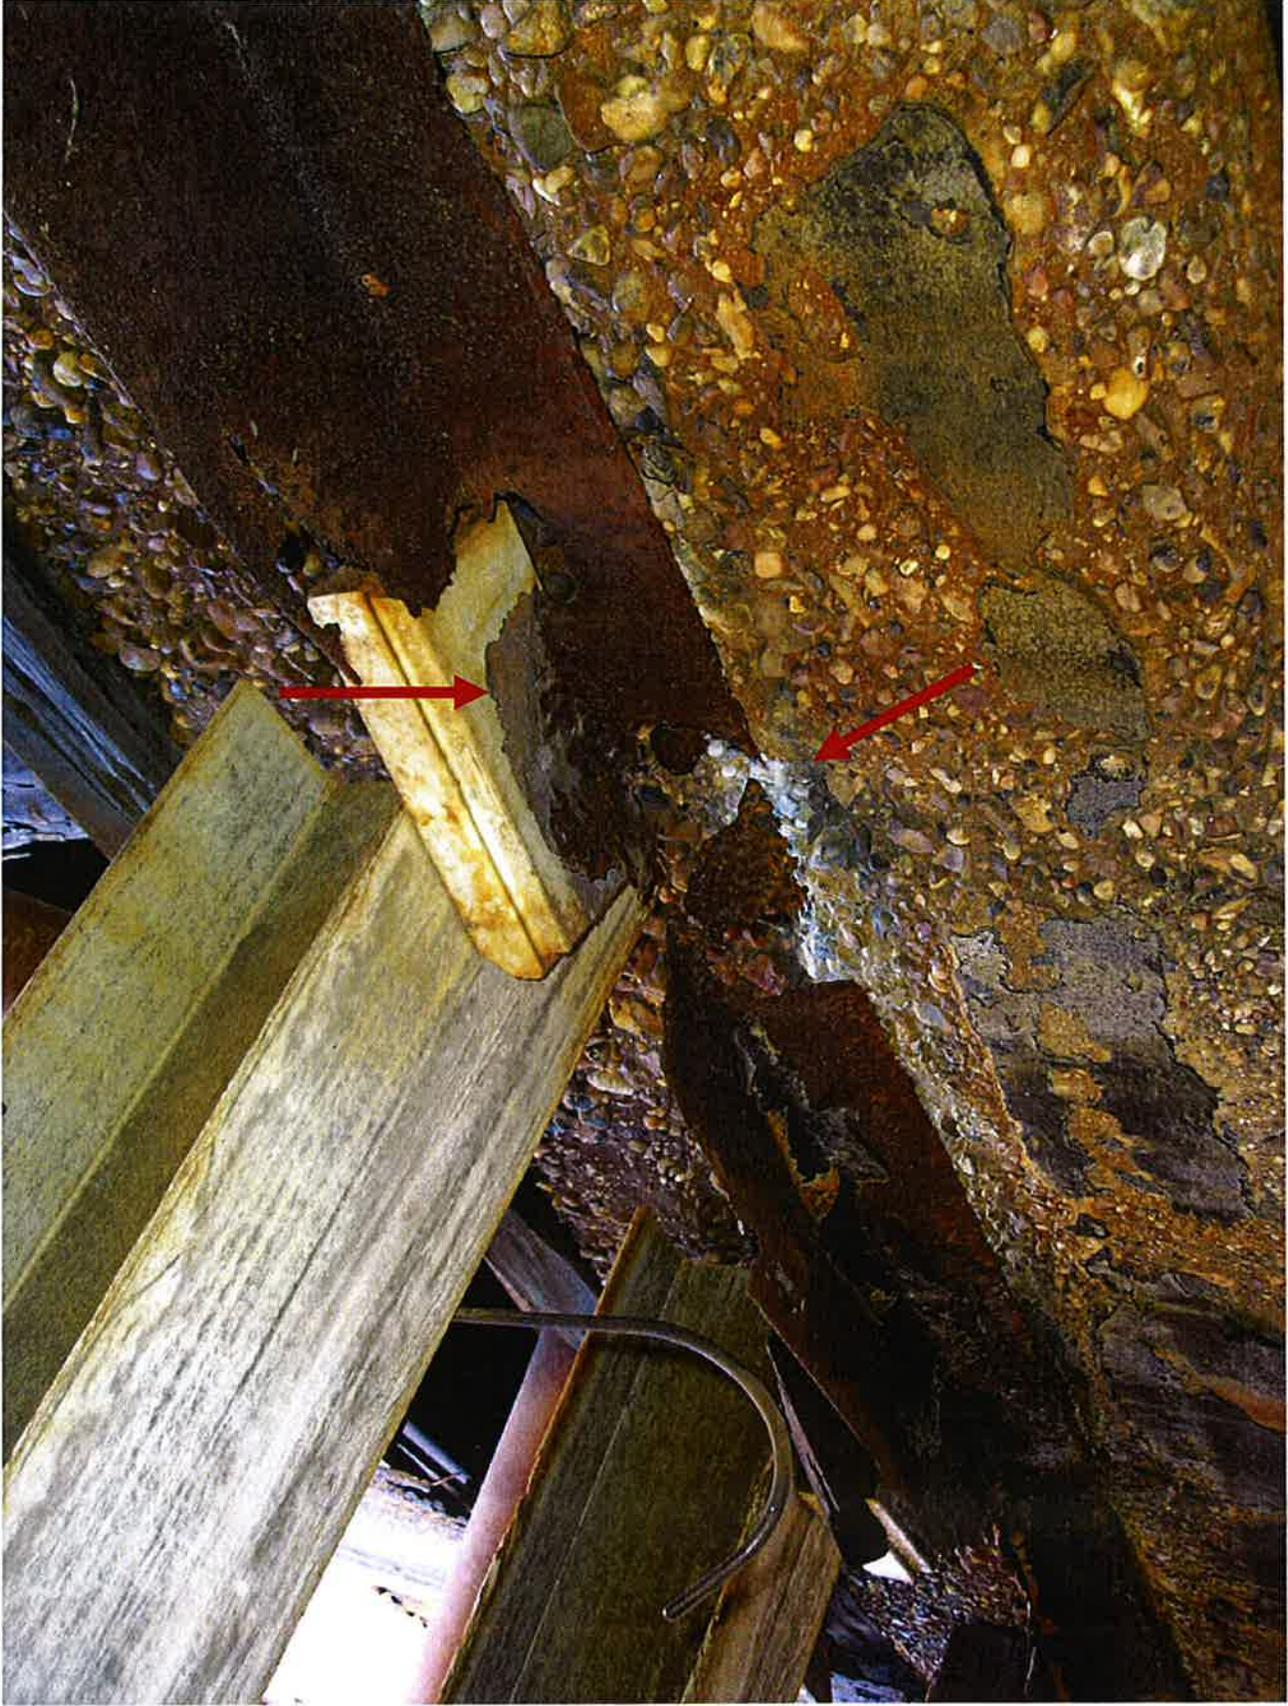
DETERIORATED SUPPORT OF FIBERGLASS BEAM AT CATWALK AT WEST SIDE OF BUILDING 26
